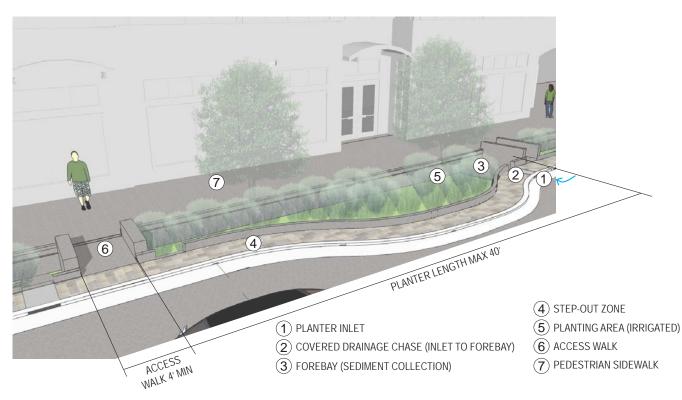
Bumpout Stormwater Planter Isometric Diagram (Source: Stream Design. 2015.)
